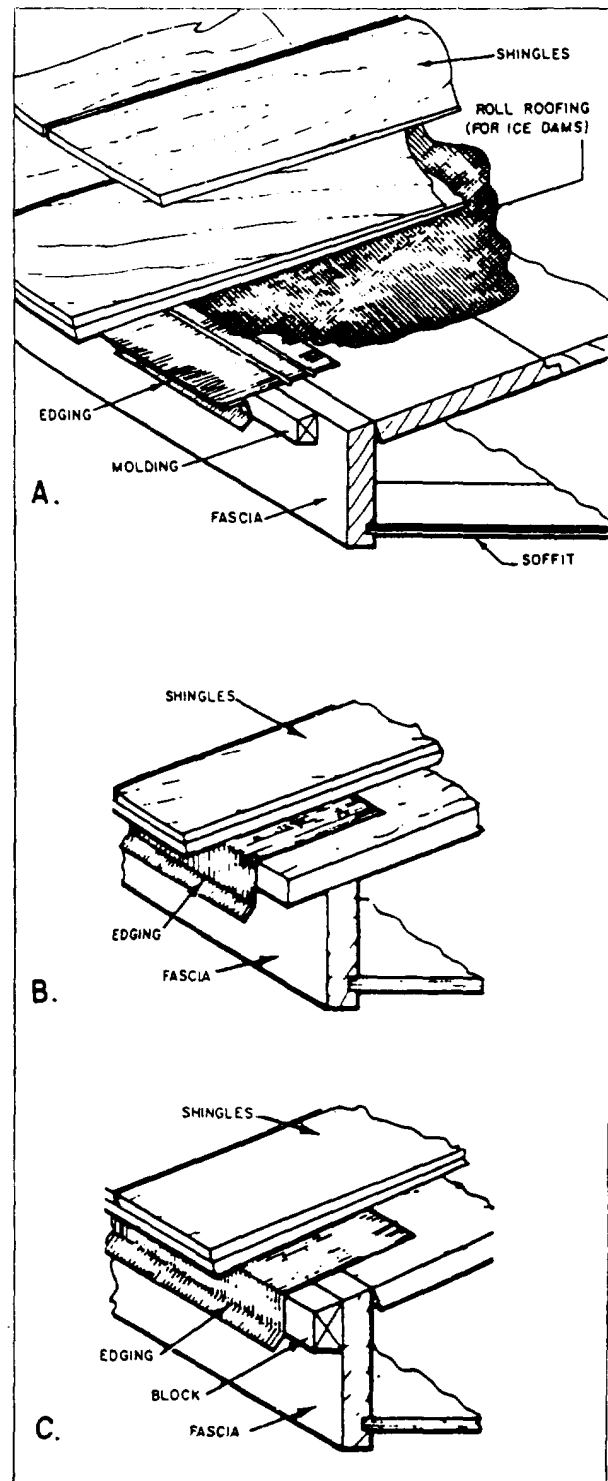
Cornice flashing: A. Formed flashing; B. Flashing without wood blocking; C. Flashing with wood blocking.
